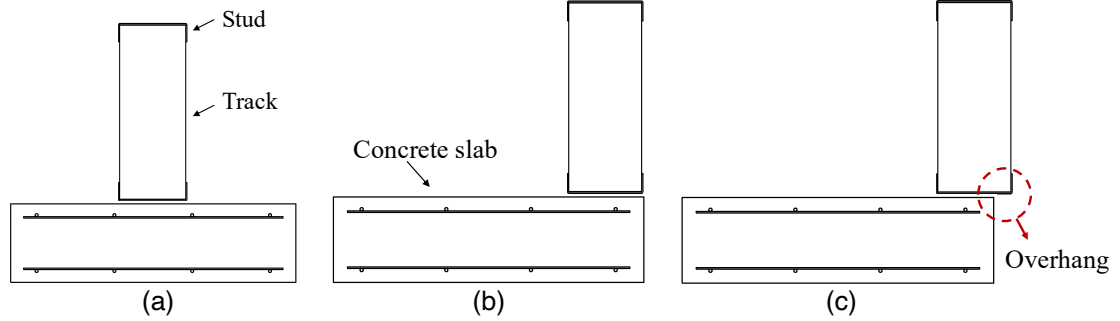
Schematic of bearing conditions; (a) Full bearing condition, (b) at the edge bearing condition, (c) 1 inch (25.4 mm) bearing condition.
